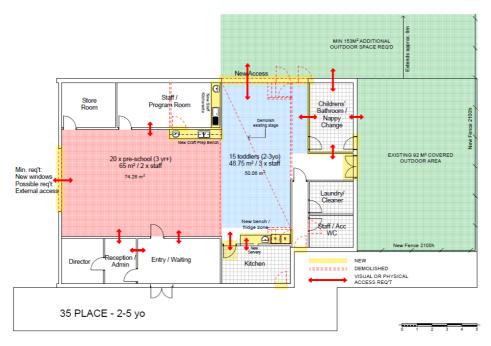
Preliminary floor plan of child care centre *Source: Tallowwood
